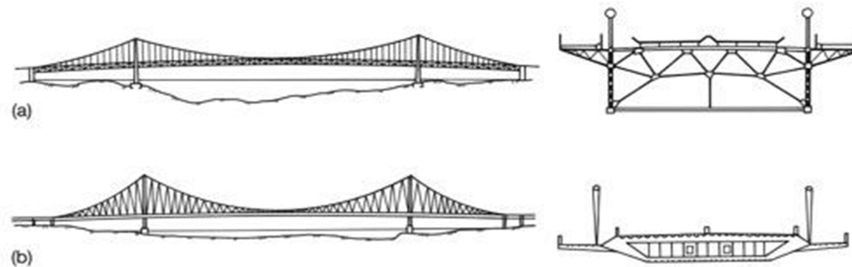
Change in design of suspension bridge, compare design and cross section between Forth Road Bridge (1964) and Severn Bridge (1966) [11]
